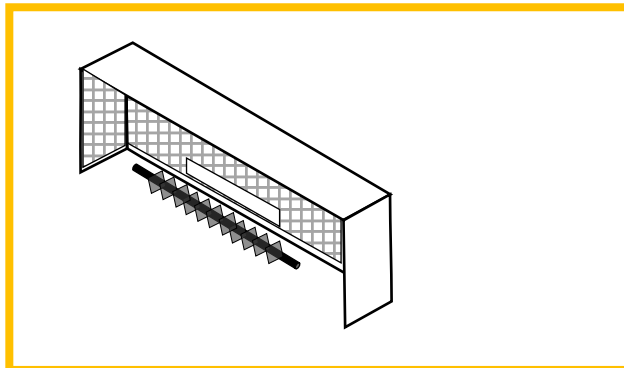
Generic Radiator Cover – Can be constructed out of wood or metal but must have a front opening for the front grille. All interior surfaces must be insulated with thermoacoustic insulation (R Rating: 2.2)
